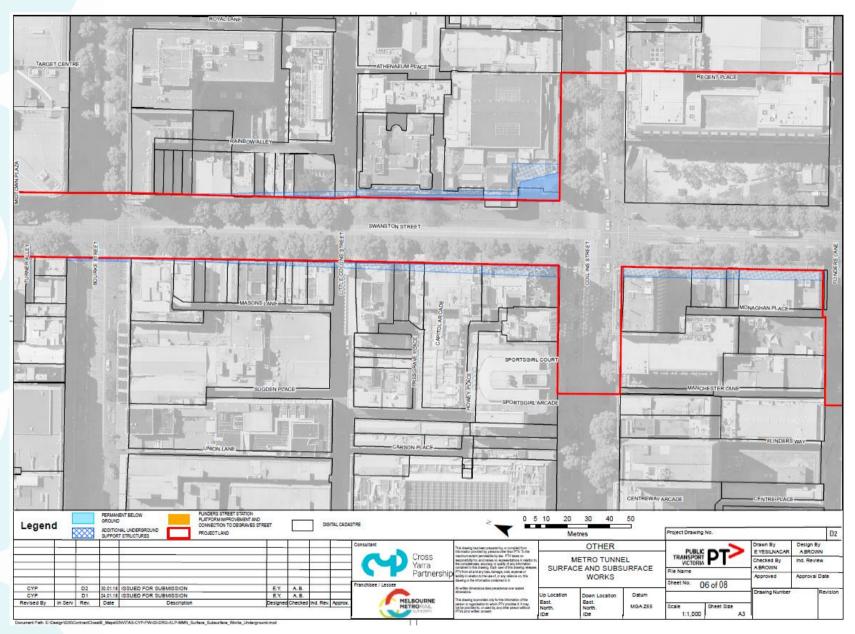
ADDITIONAL PROJECT LAND REQUIRED FOR PERMANENT BELOWGROUND AND UNDERGROUND SUPPORT STRUCTURES AT CBD SOUTH STATION
